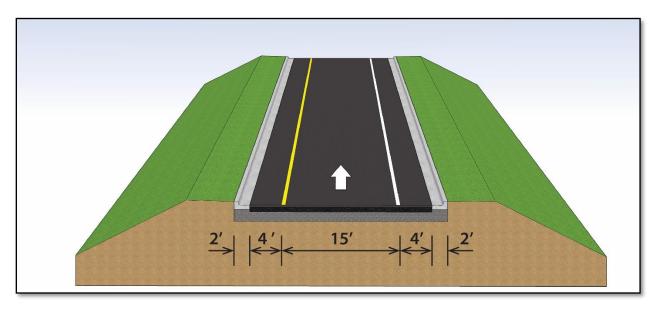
Existing Typical Section – Exit Ramp 6B
